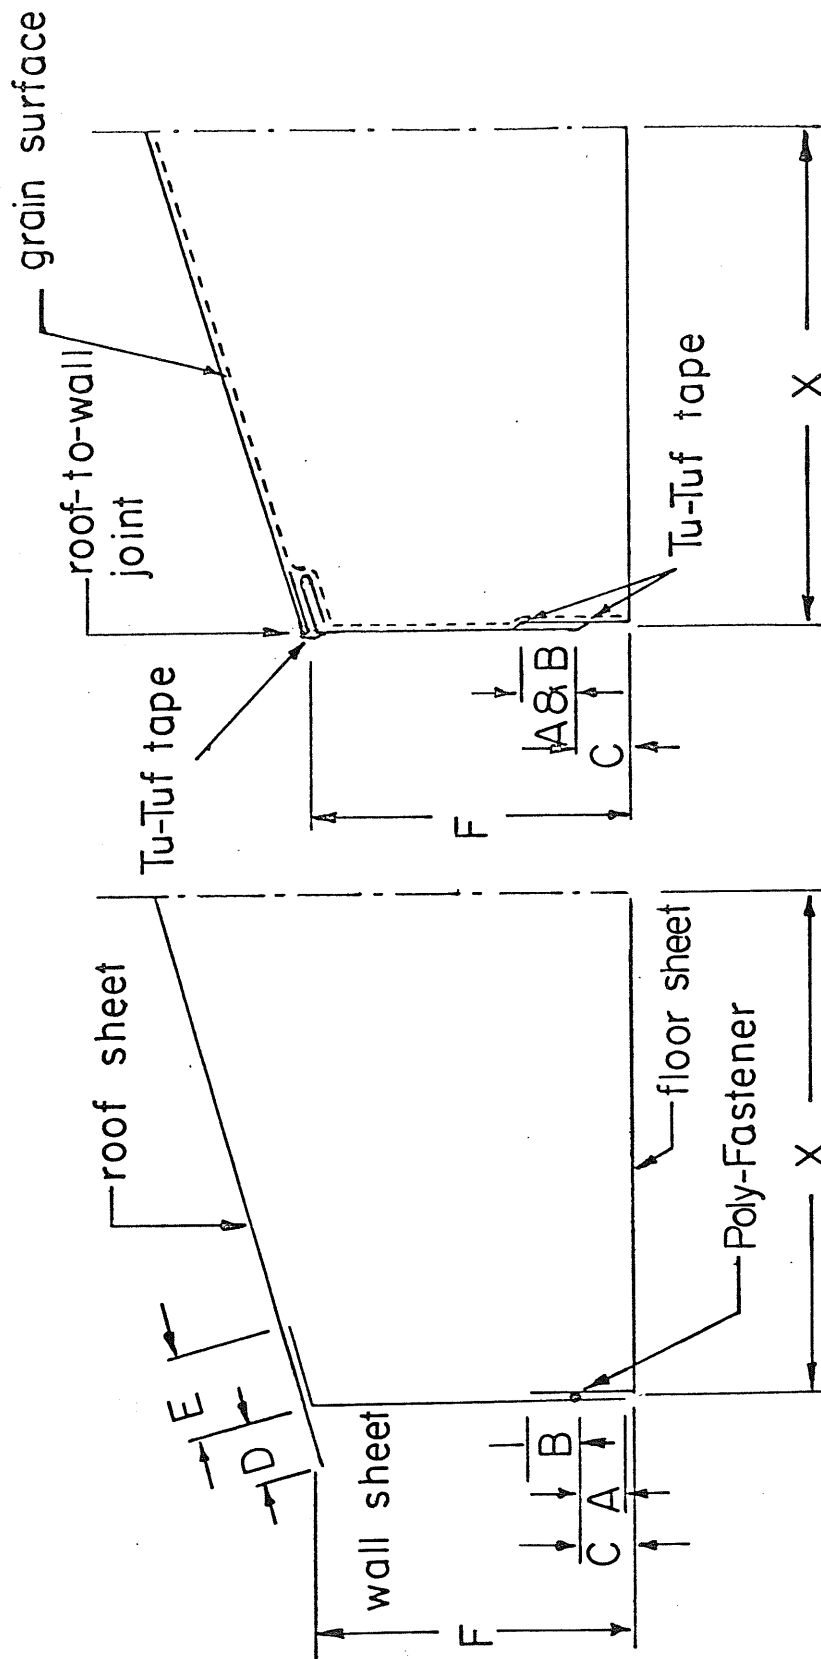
Cylindrical bin with Fabrene wall and conical roof.
